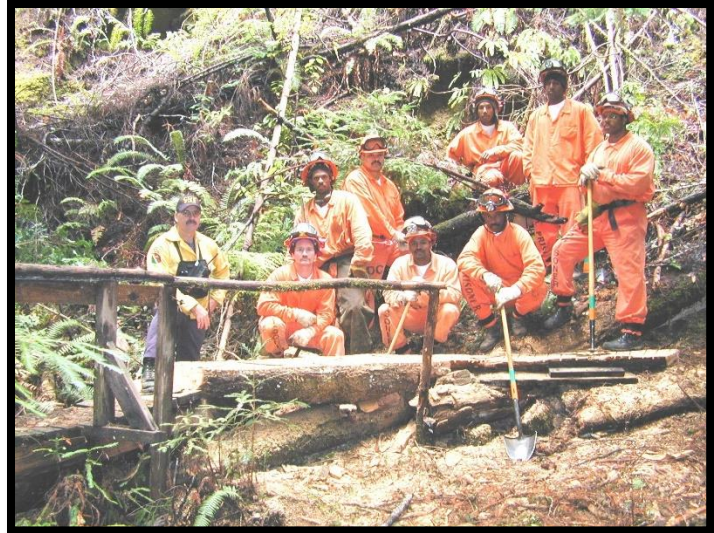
2004. Parlin Fork inmate crew building a trail bridge.
